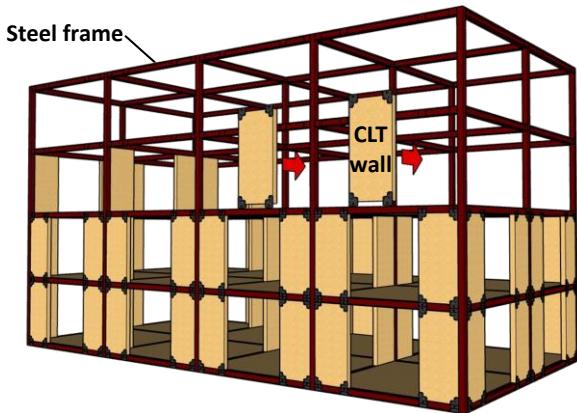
Basic concept of the proposed CLT-steel hybrid structure.
